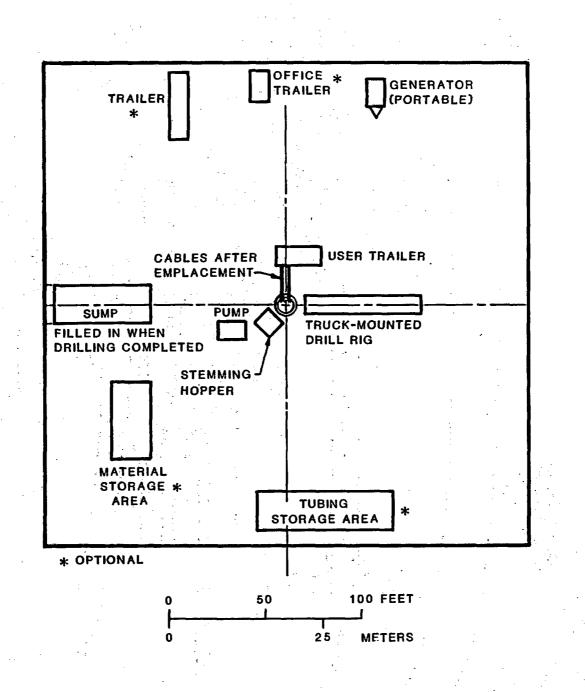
Typical site plan for shallow geologic exploratory holes.
